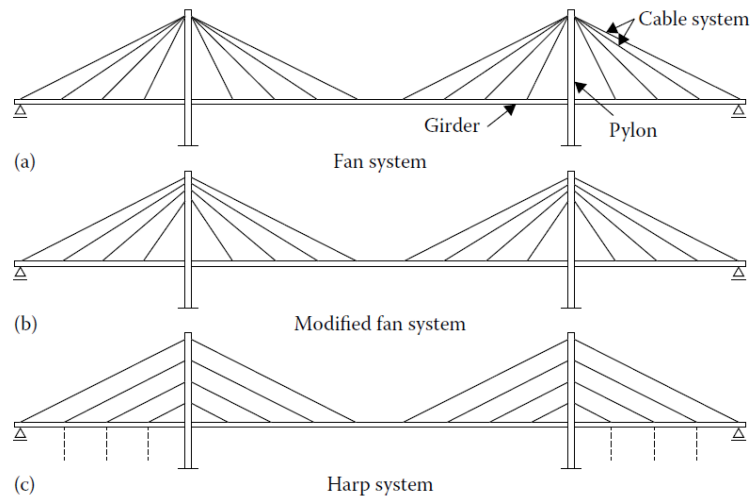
Type of cable stayed bridge based on cable arrangement [2]
